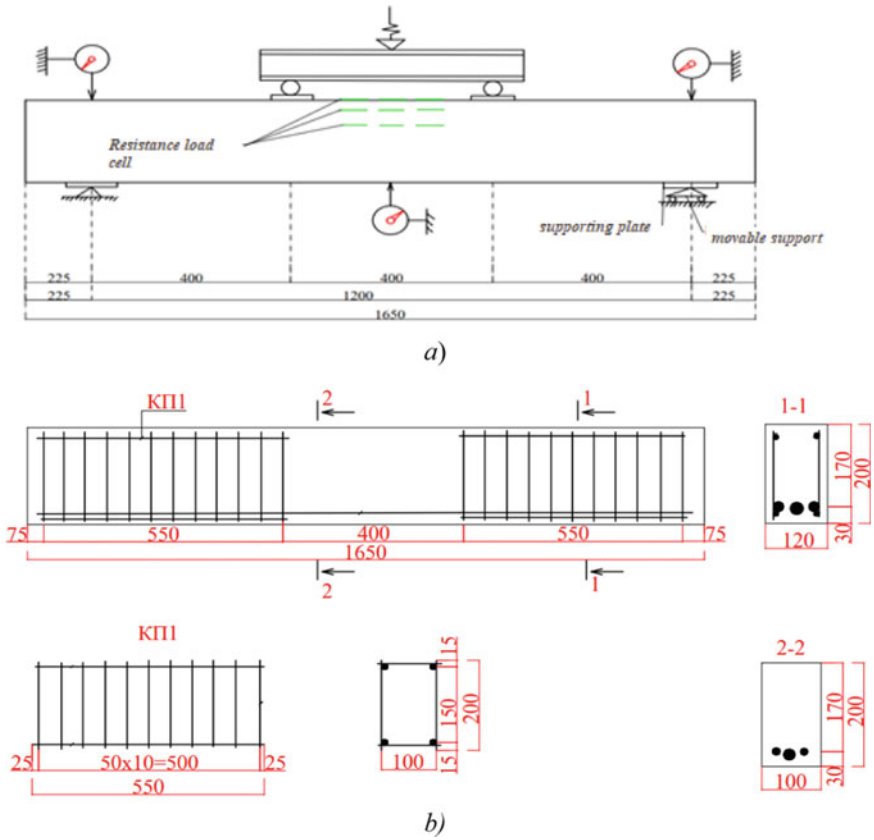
a the test circuit of the beams; b reinforcement of reinforced concrete beams
